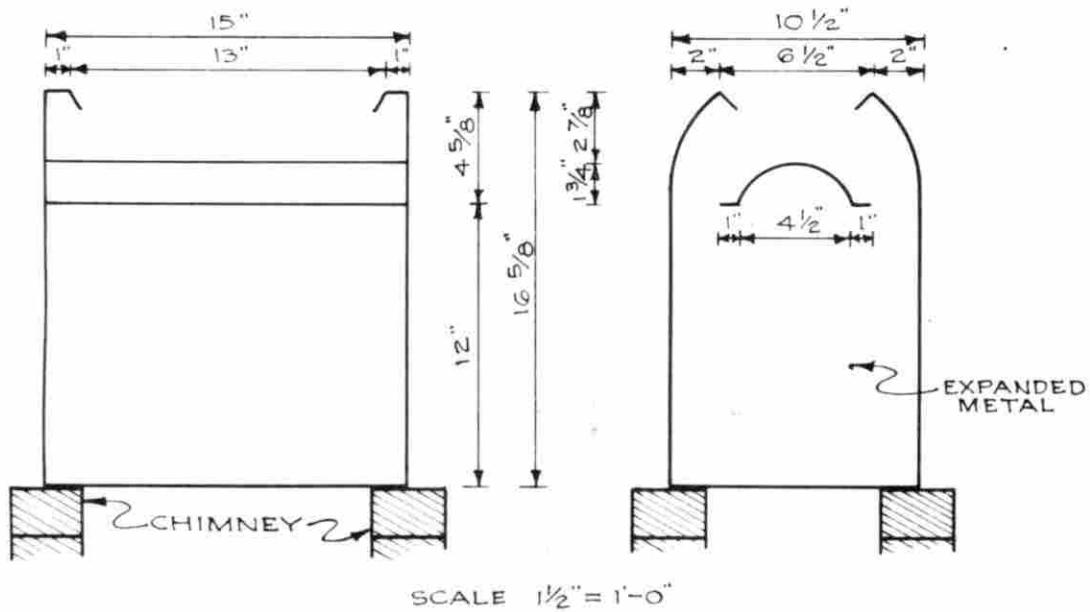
SECTIONAL SKETCH OF NO. 6 SPARK ARRESTER
